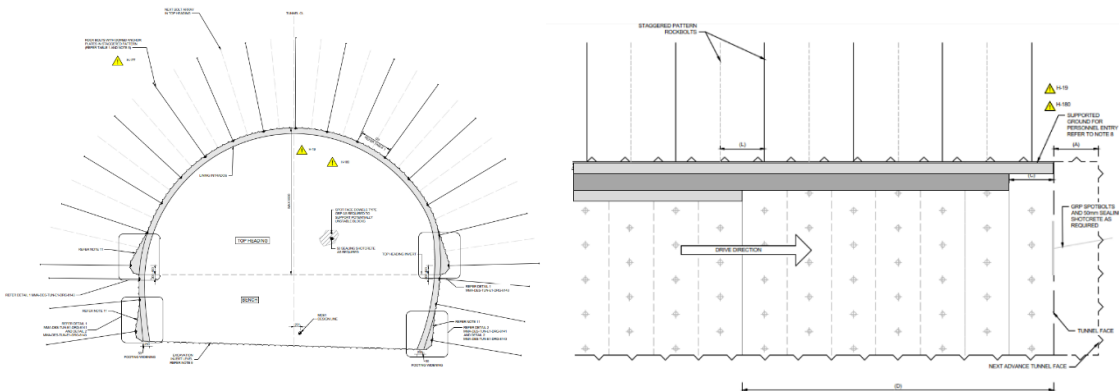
Tunnel support type st1. Left: cross section. Right: top heading construction sequence.
